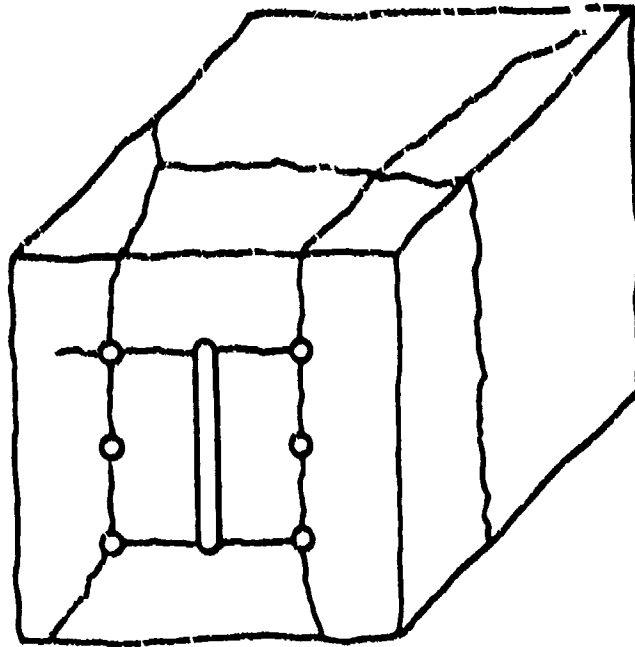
Typical Fracture - Slot and Hole Pattern - Wire Heaters
